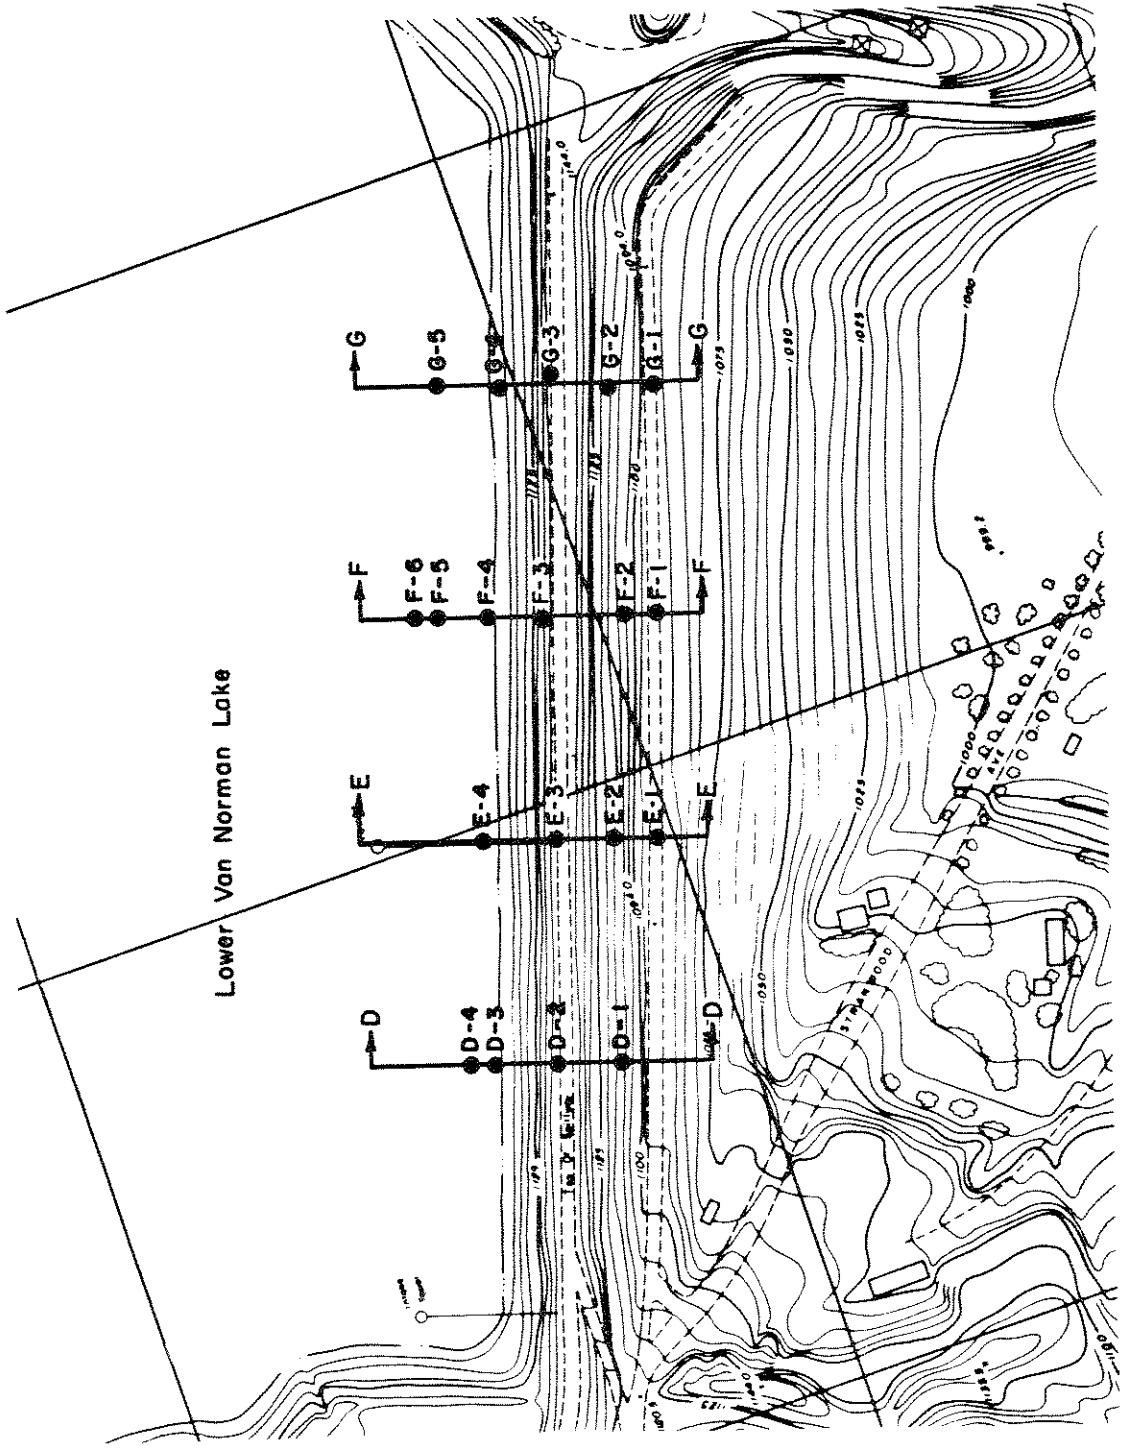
PLAN OF LOWER SAN FERNANDO DAM.
